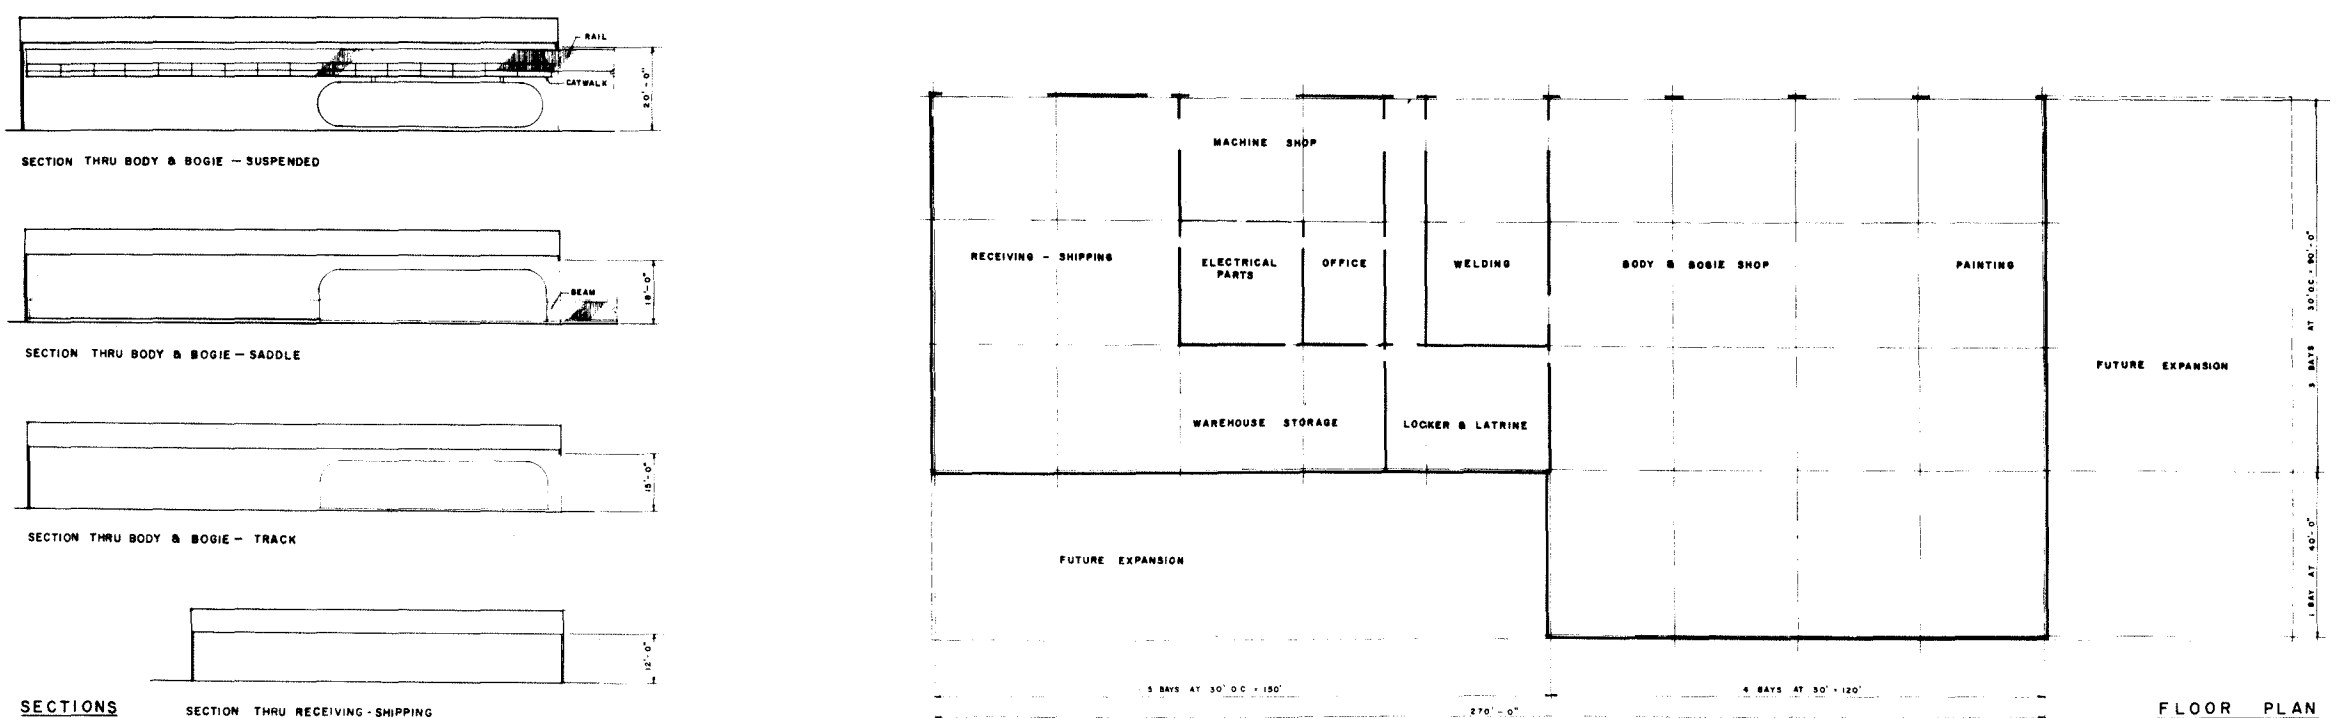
Concept of central maintenance shop - Initial installation may be expanded as needed to provide additional facilities as the system is expanded in the future. Heights shown on sections indicate openings necessary for equipment to enter the building. Total building height may vary greatly depending on type of equipment selected and manner in which servicing is to be performed.
